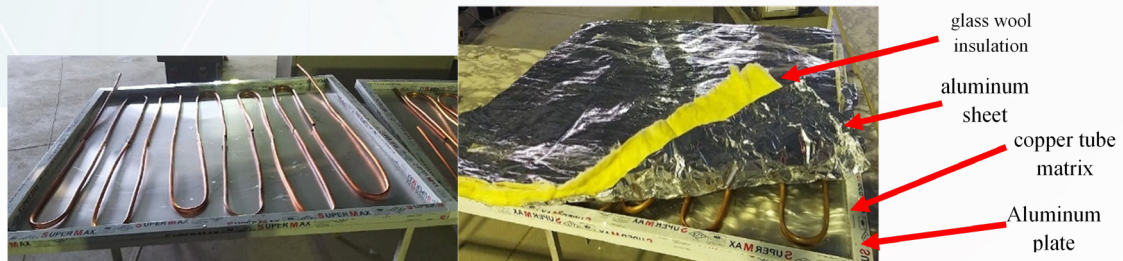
chilled ceiling panel construction showing the chilled ceiling materials.
